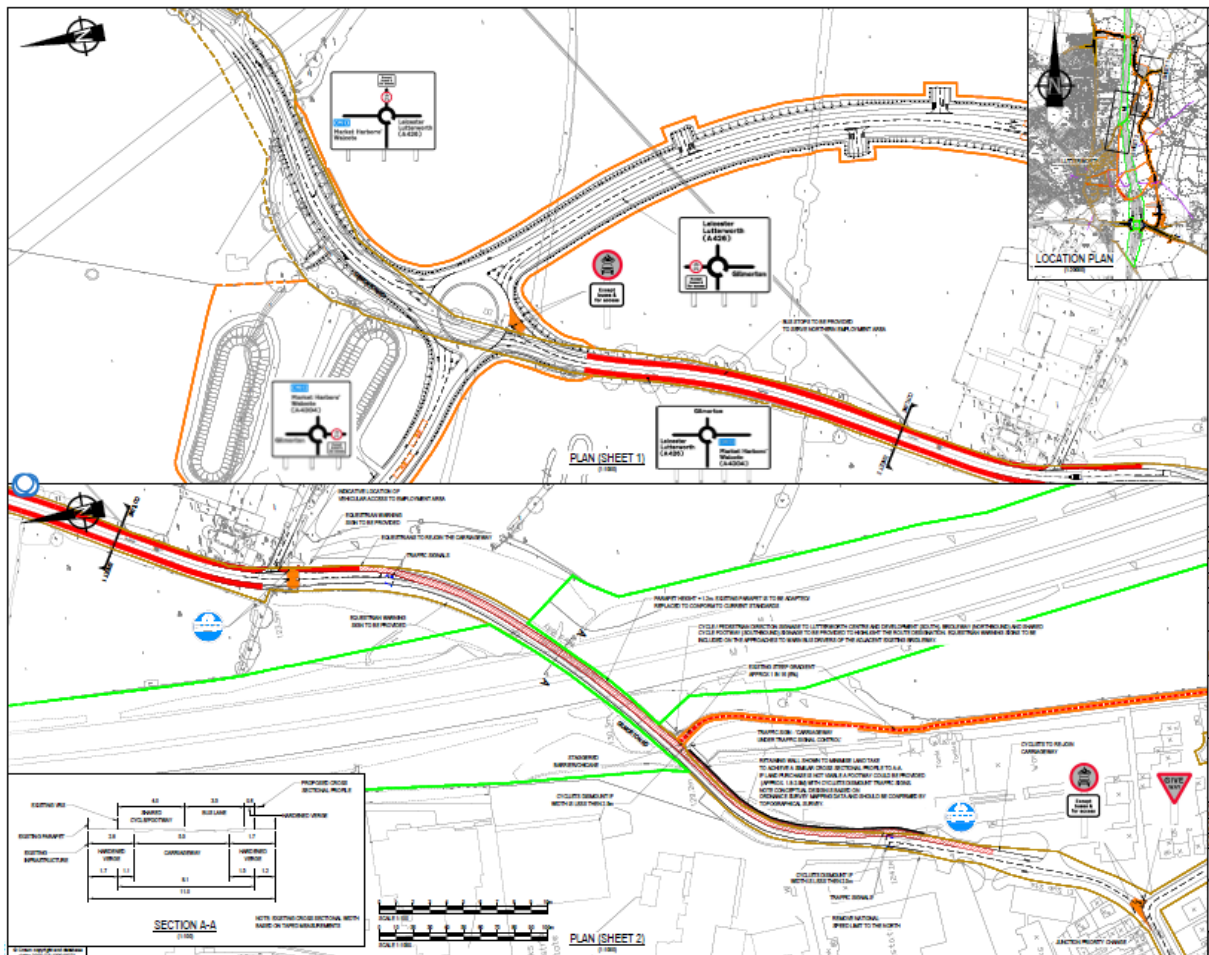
Non-Motorised user plan indicating proposed alterations to the Gilmorton Road bridge
